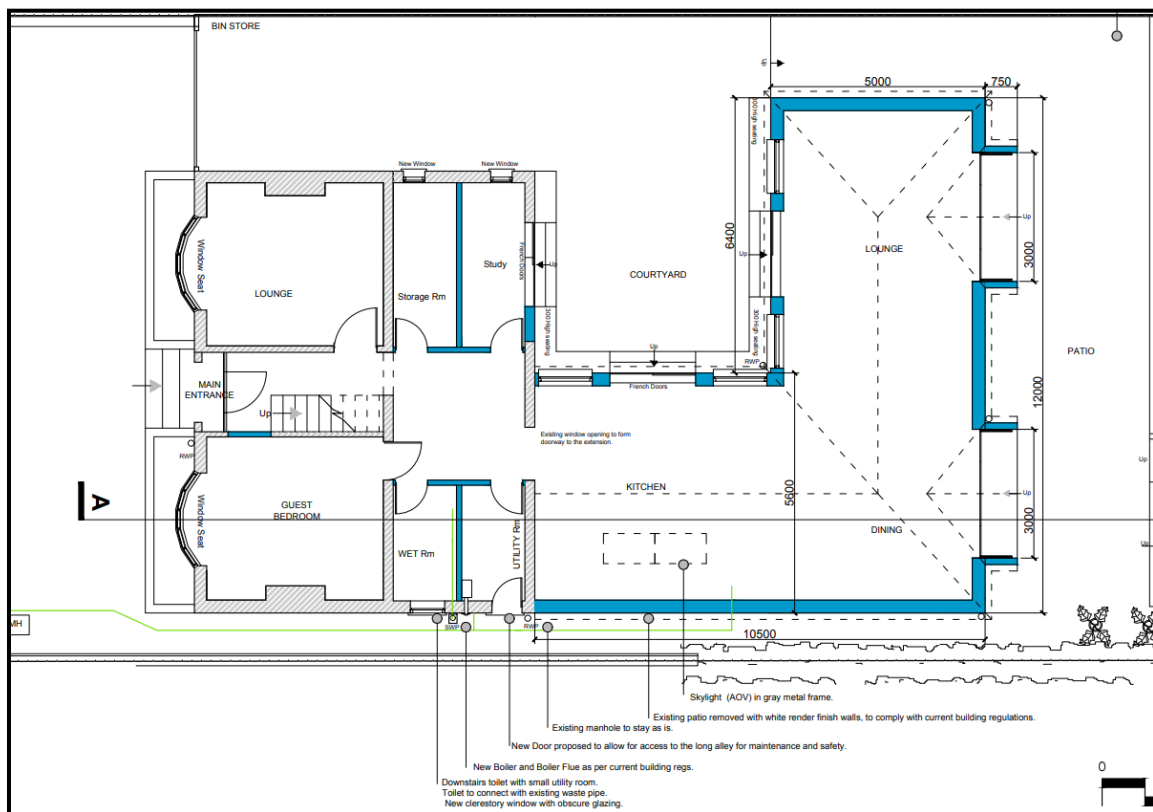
Proposed Ground Floor Plan (blue area denotes extension)
